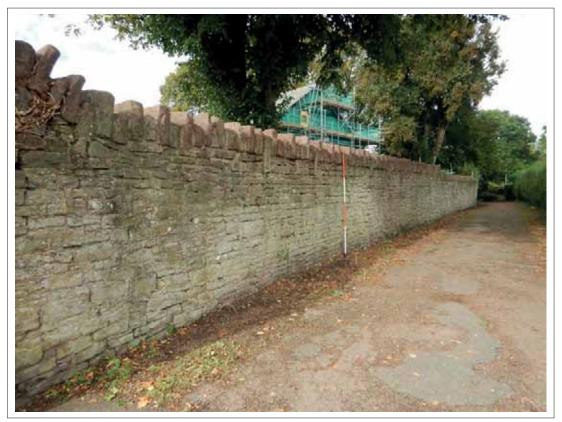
East section of the curtilage wall, looking north. 2m scale.
